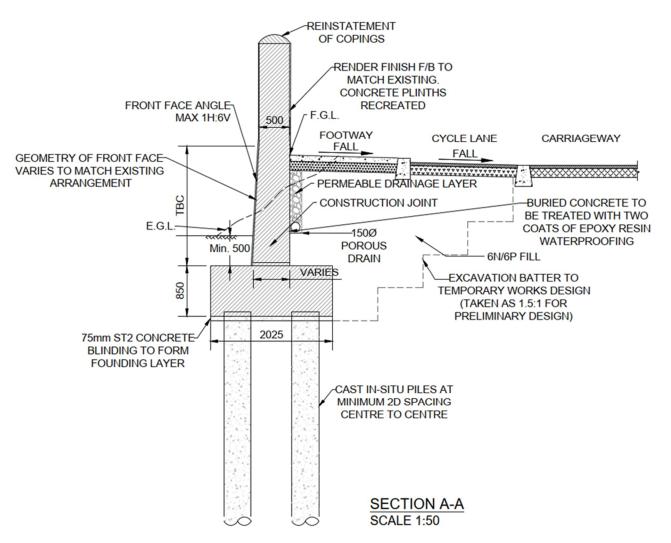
R13-RW017 Typical Cross-Section
